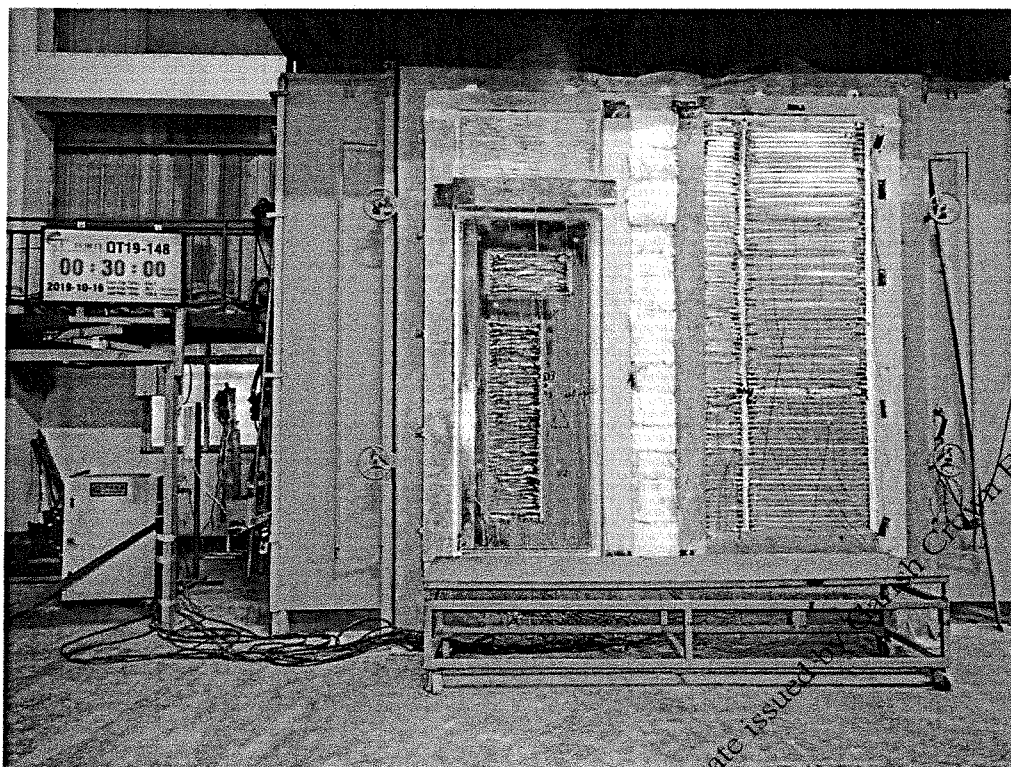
Unexposed surface of the specimens at 30 minutes of test.
